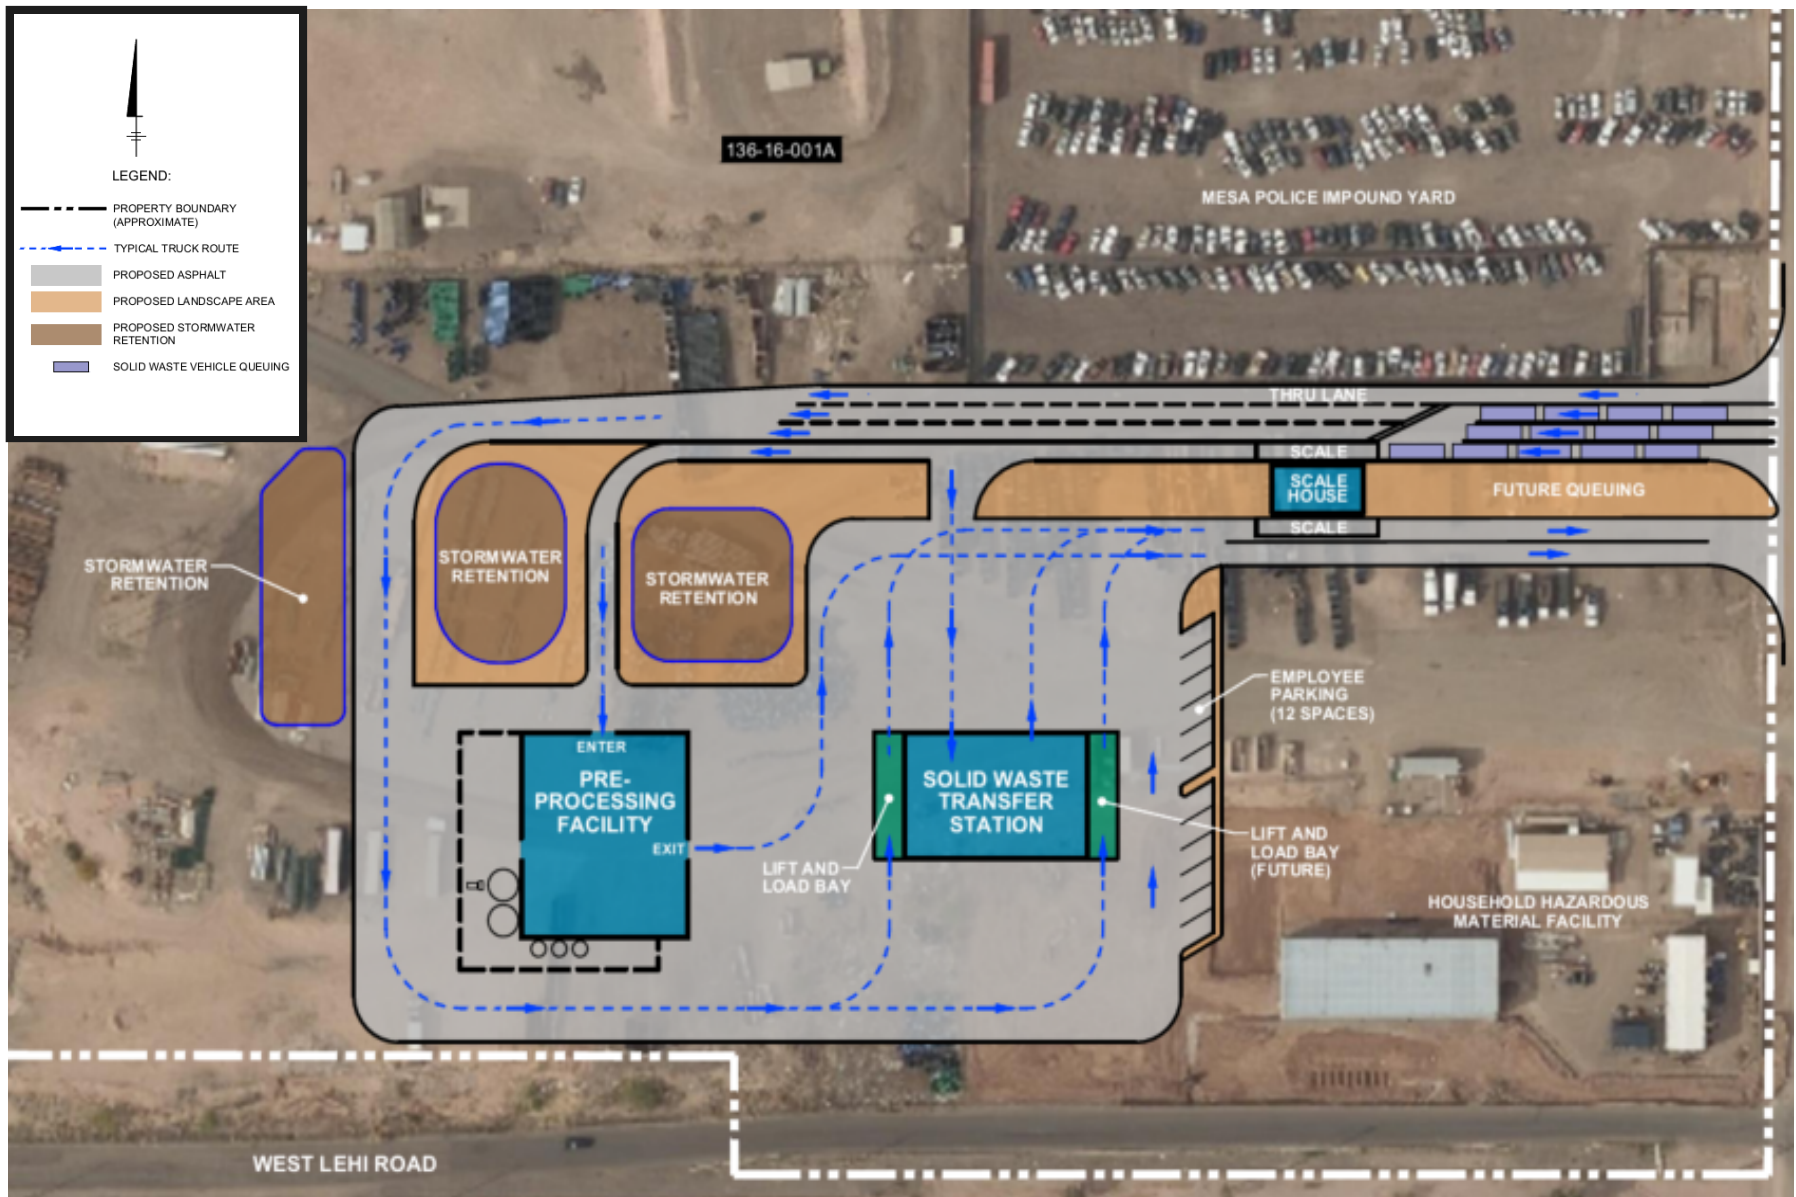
Center Street Yard Solid Waste Transfer Station Concept Site Layout
